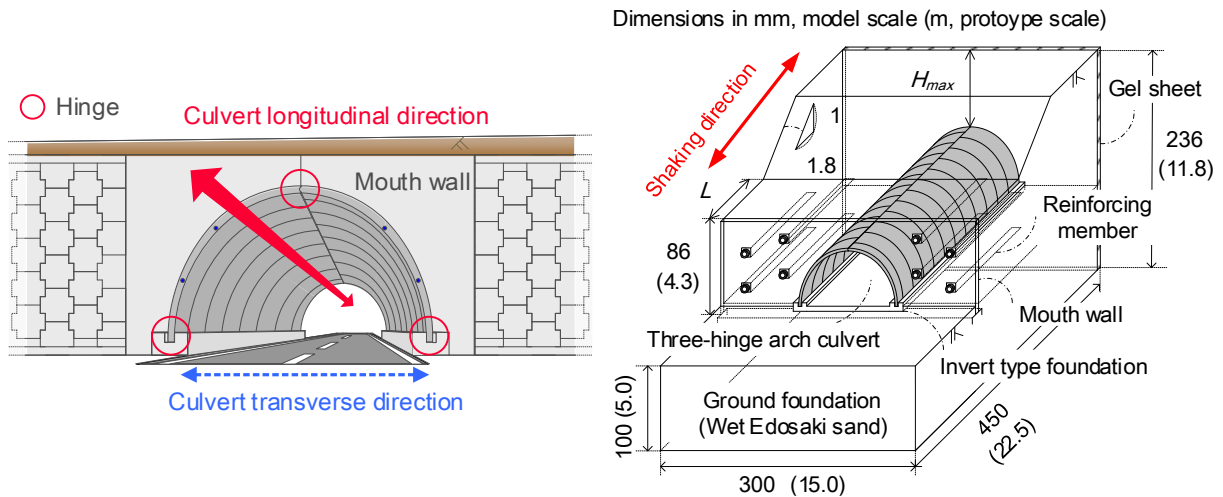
Schematic drawings of (a) three-hinged arch culvert installed in embankment and (b) experimental model.
